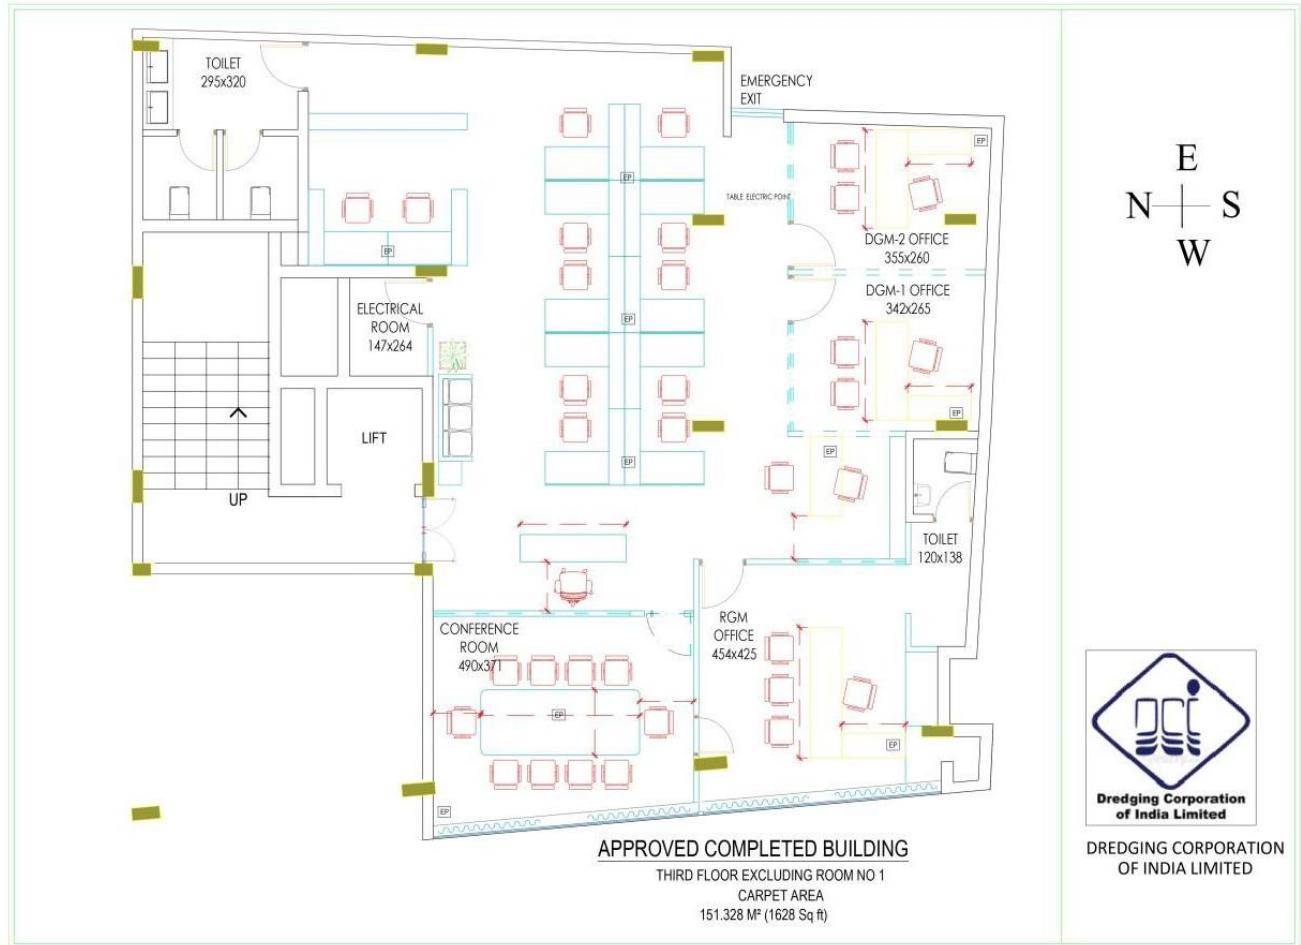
THIRD FLOOR TYPICAL PLAN/LAYOUT
